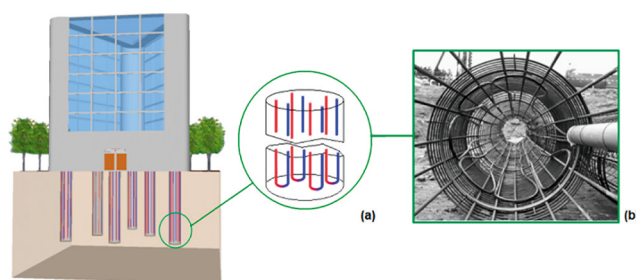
Column used in energy facilities: a) pipe-positioning scheme in a column; b) geothermal pipes attached to a column reinforcement [14]
